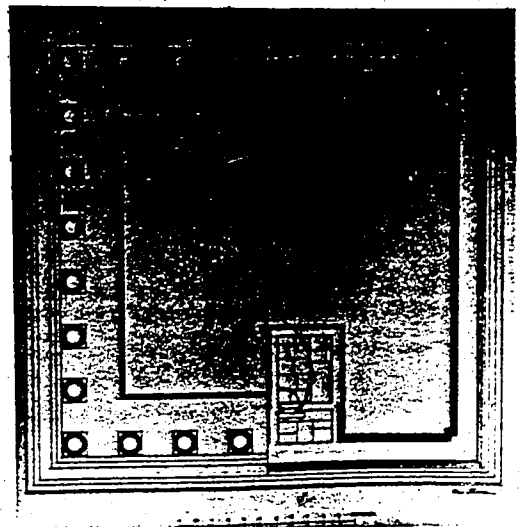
Belevi Mausoleum, plan of lower and upper storeys
